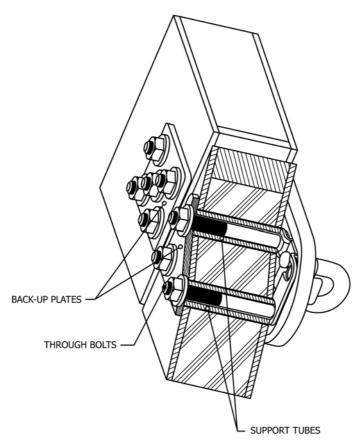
Example of Back-Up Plate and Through Bolt Installation
